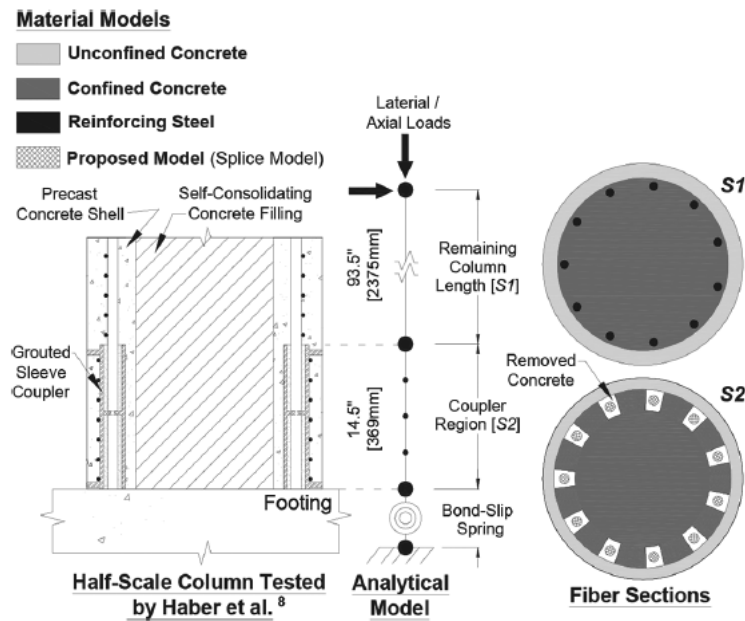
Analytical model for bridge column with grouted sleeve column-footing connection (Haber, et al. 2015)
